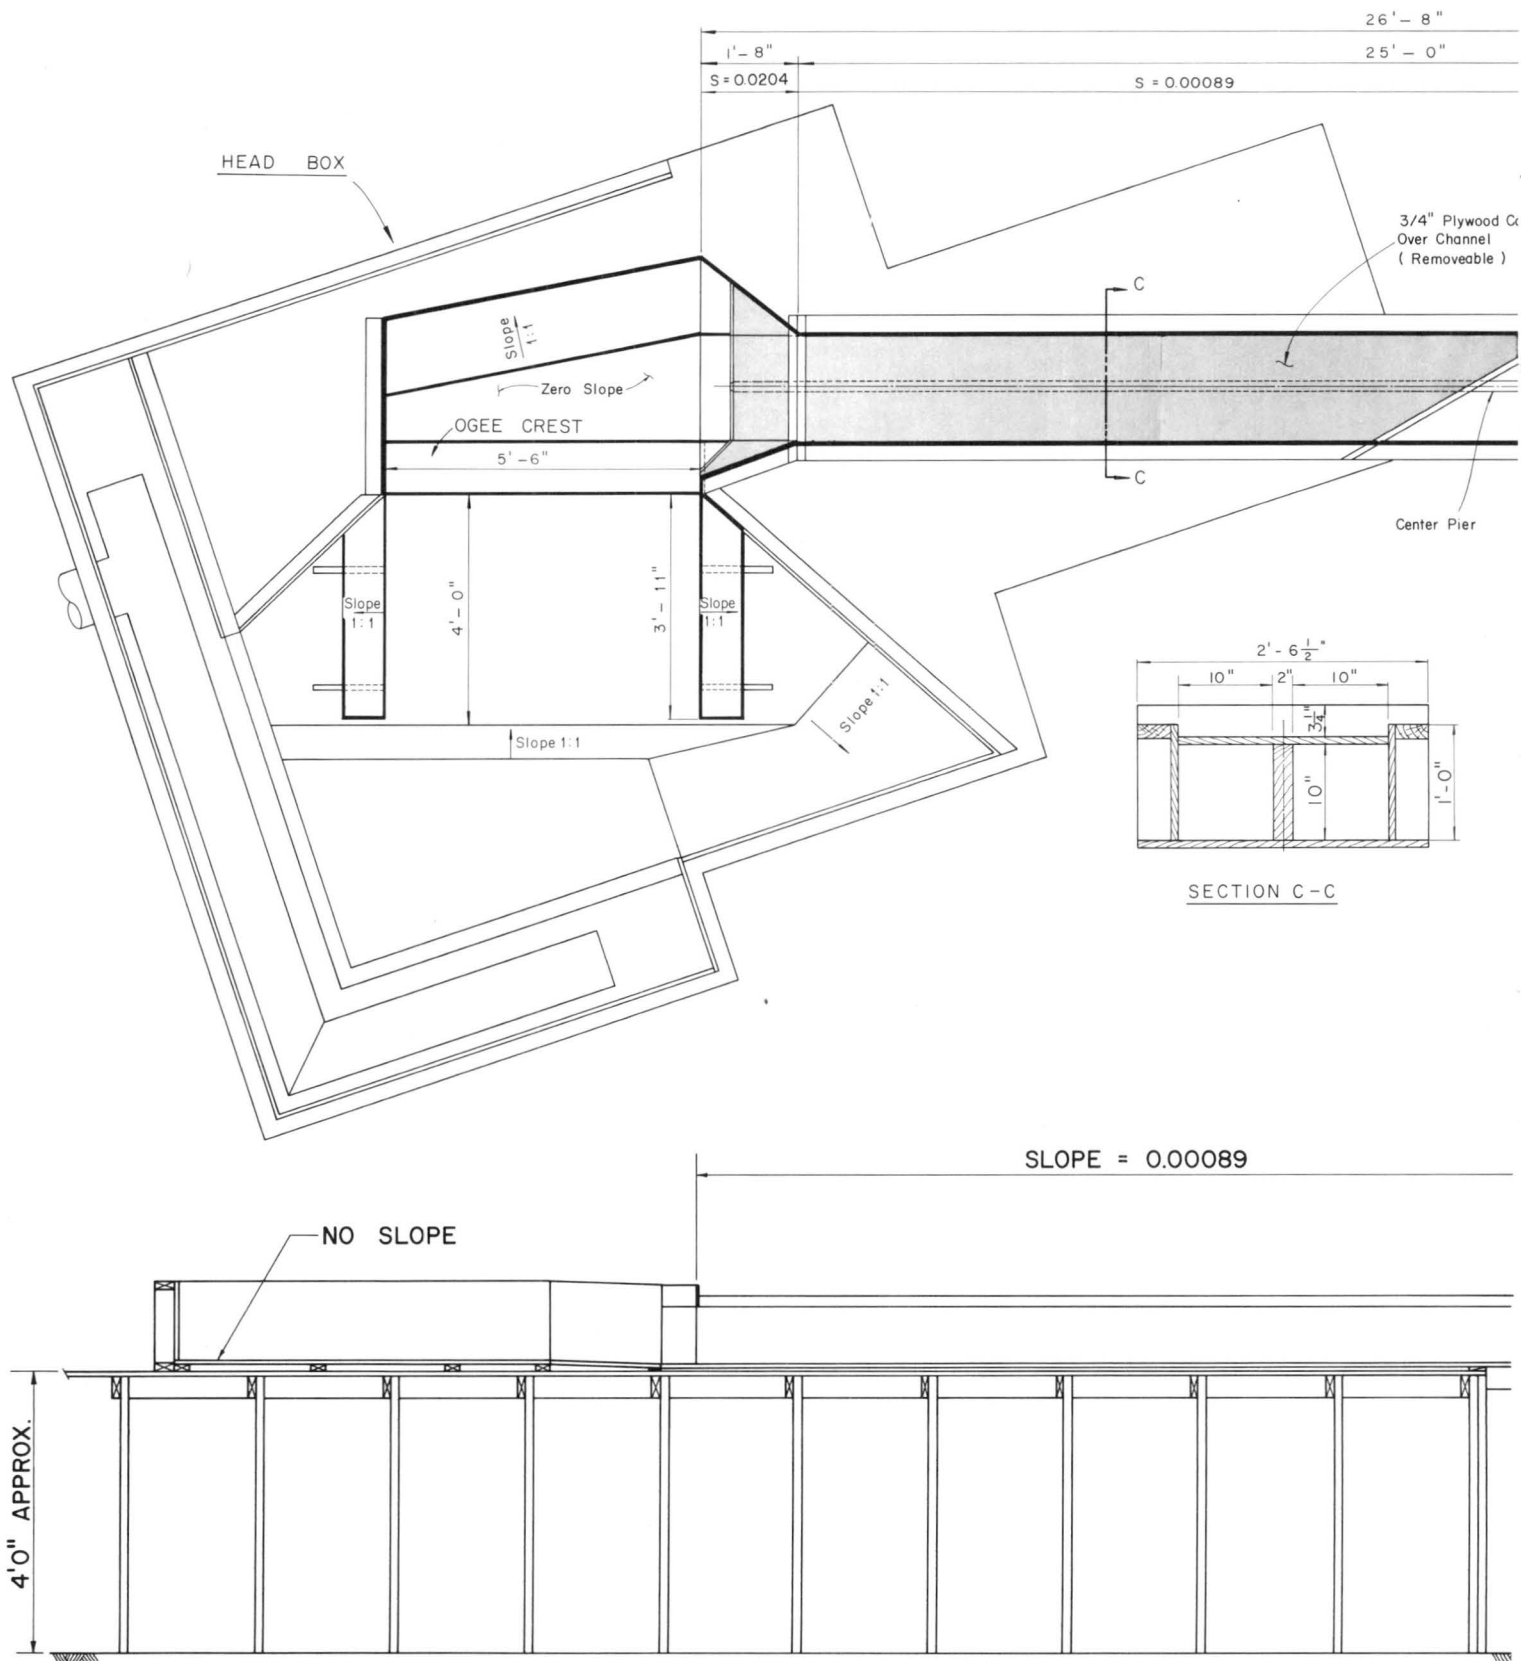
Plan view and center line profile of the Eagle Mountain Dam Spillway model
